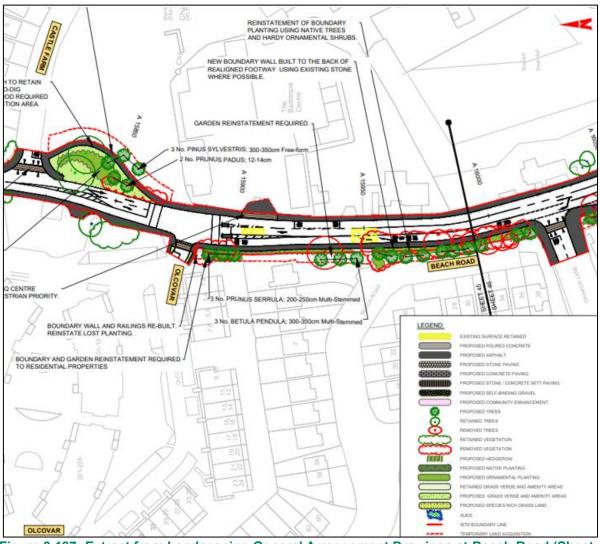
Extract from Landscaping General Arrangement Drawings at Beech Road (Sheet 45)
